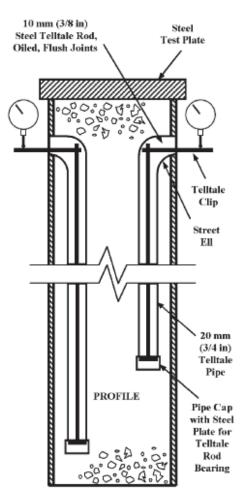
Typical Installation of Telltales for Pipe Piles (from ASTM D1143)
